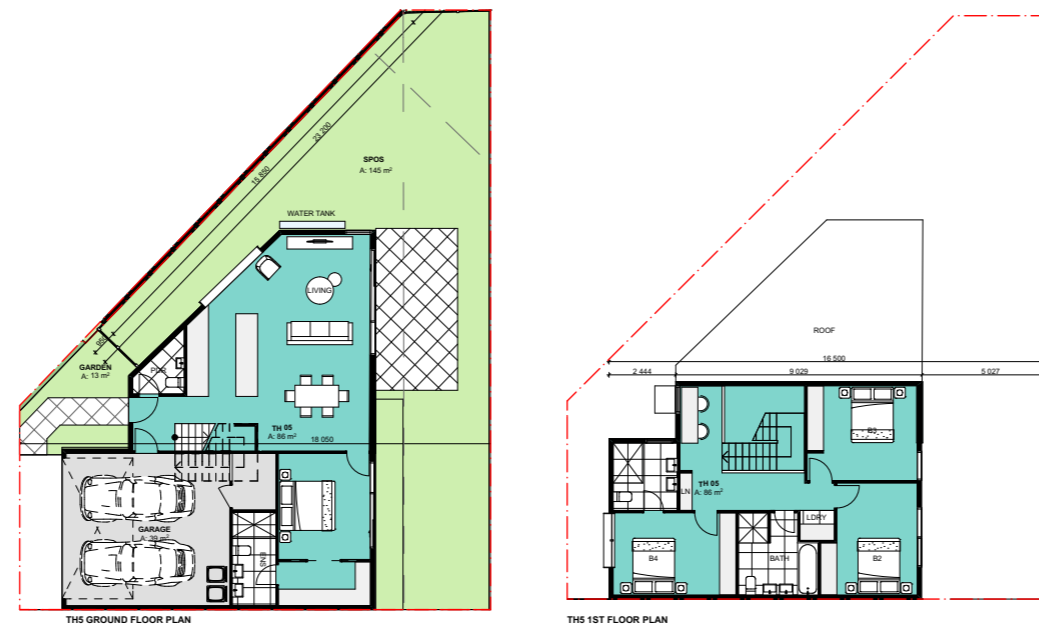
Townhouse Type 5 (Source: Plus Architecture)
